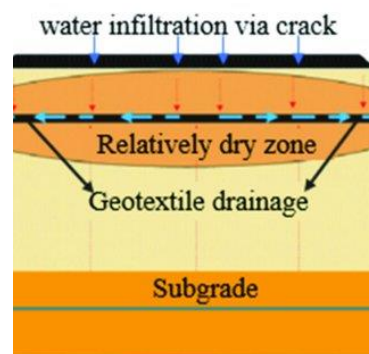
Subsurface Drainage Design with the Wicking Geotextiles (Hao, W. *et al.* 2020)
